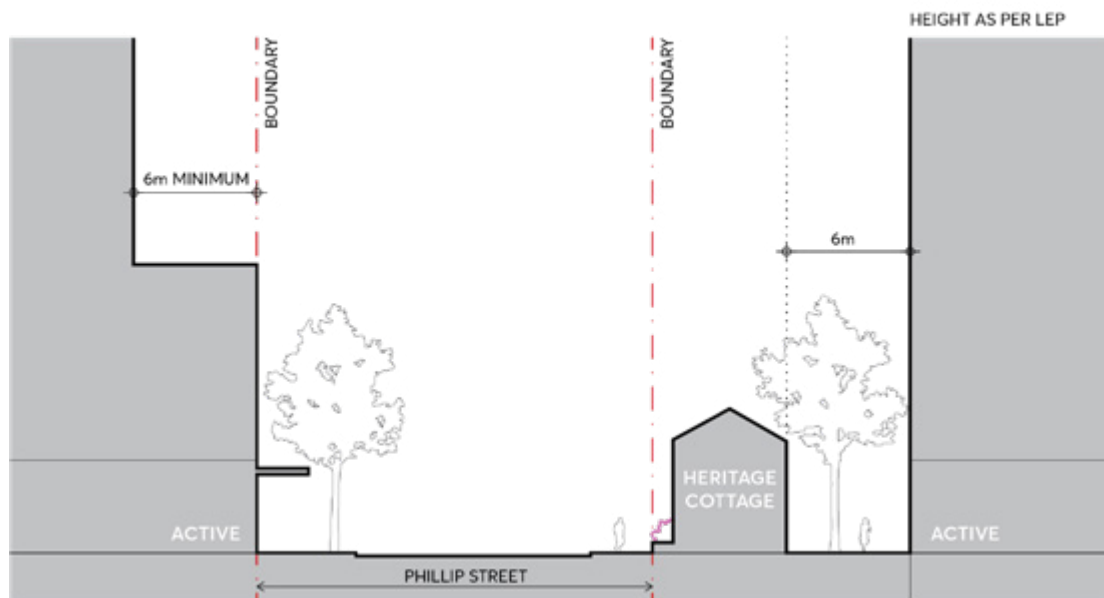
City East Block Phillip Street at 66 Phillip Street (Section C)
